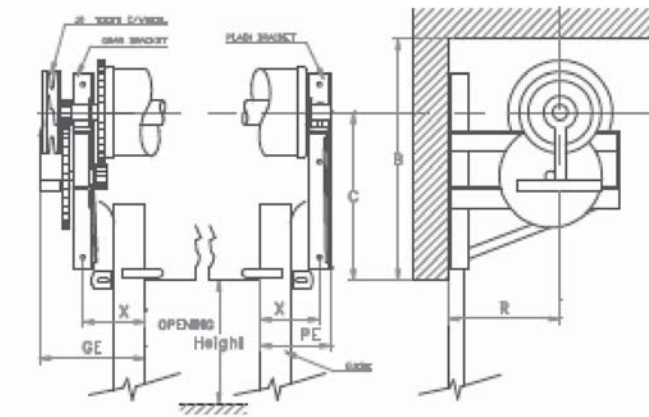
BRACKETS LAYOUT WITH INSIDE MOUNT MOTOR
